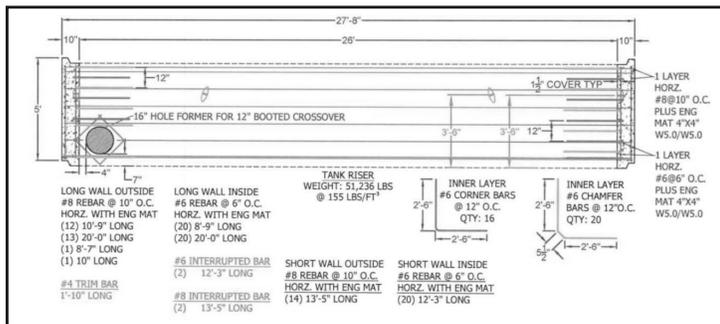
Reinforcement layout for the 10-inch tank walls, showing rebar spacing and structural detailing
